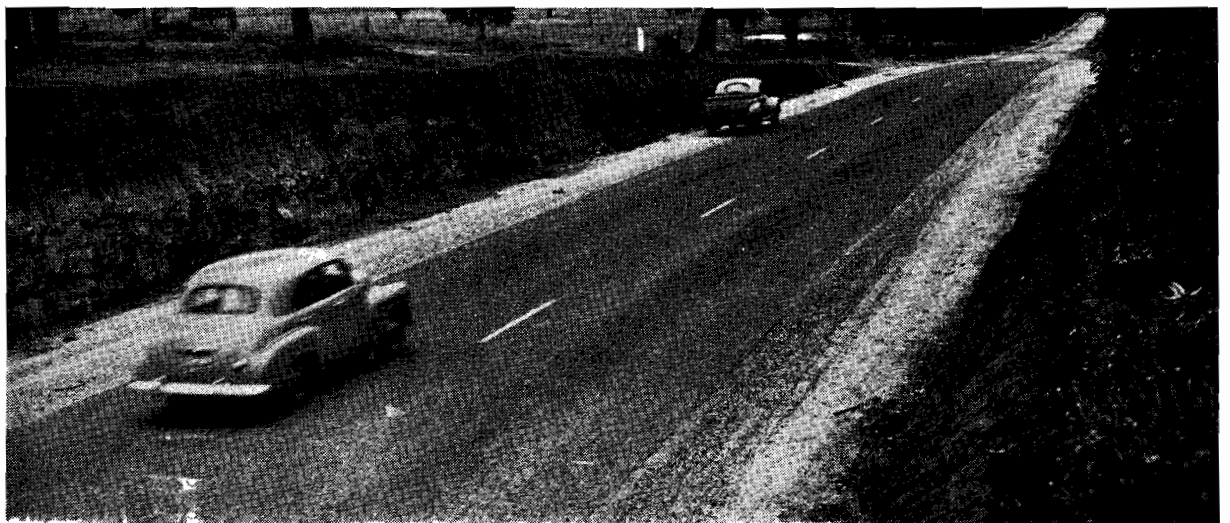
Hume Highway. Reconstruction of failed section near Springhurst.
